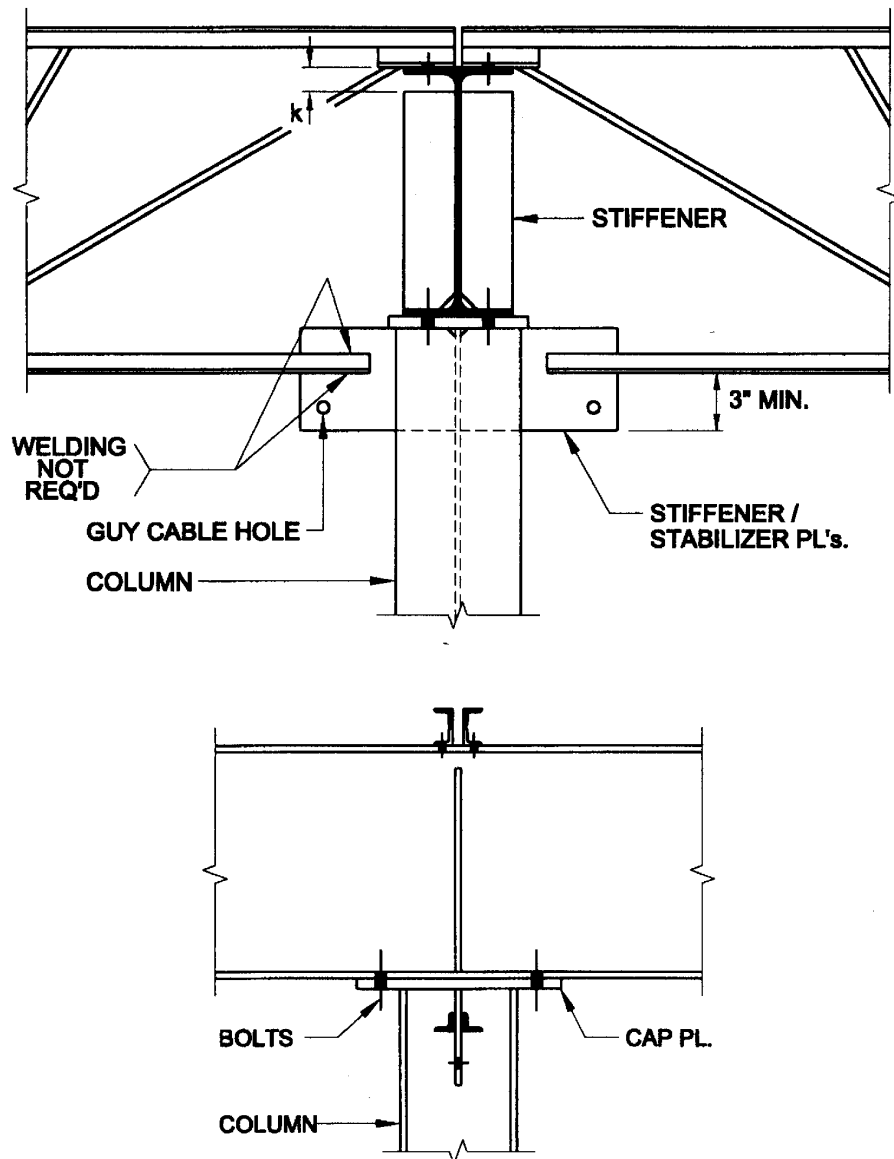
Beam framing continuously over column top, stability provided with transverse stiffeners, joist-chord extensions located at column top not welded.
